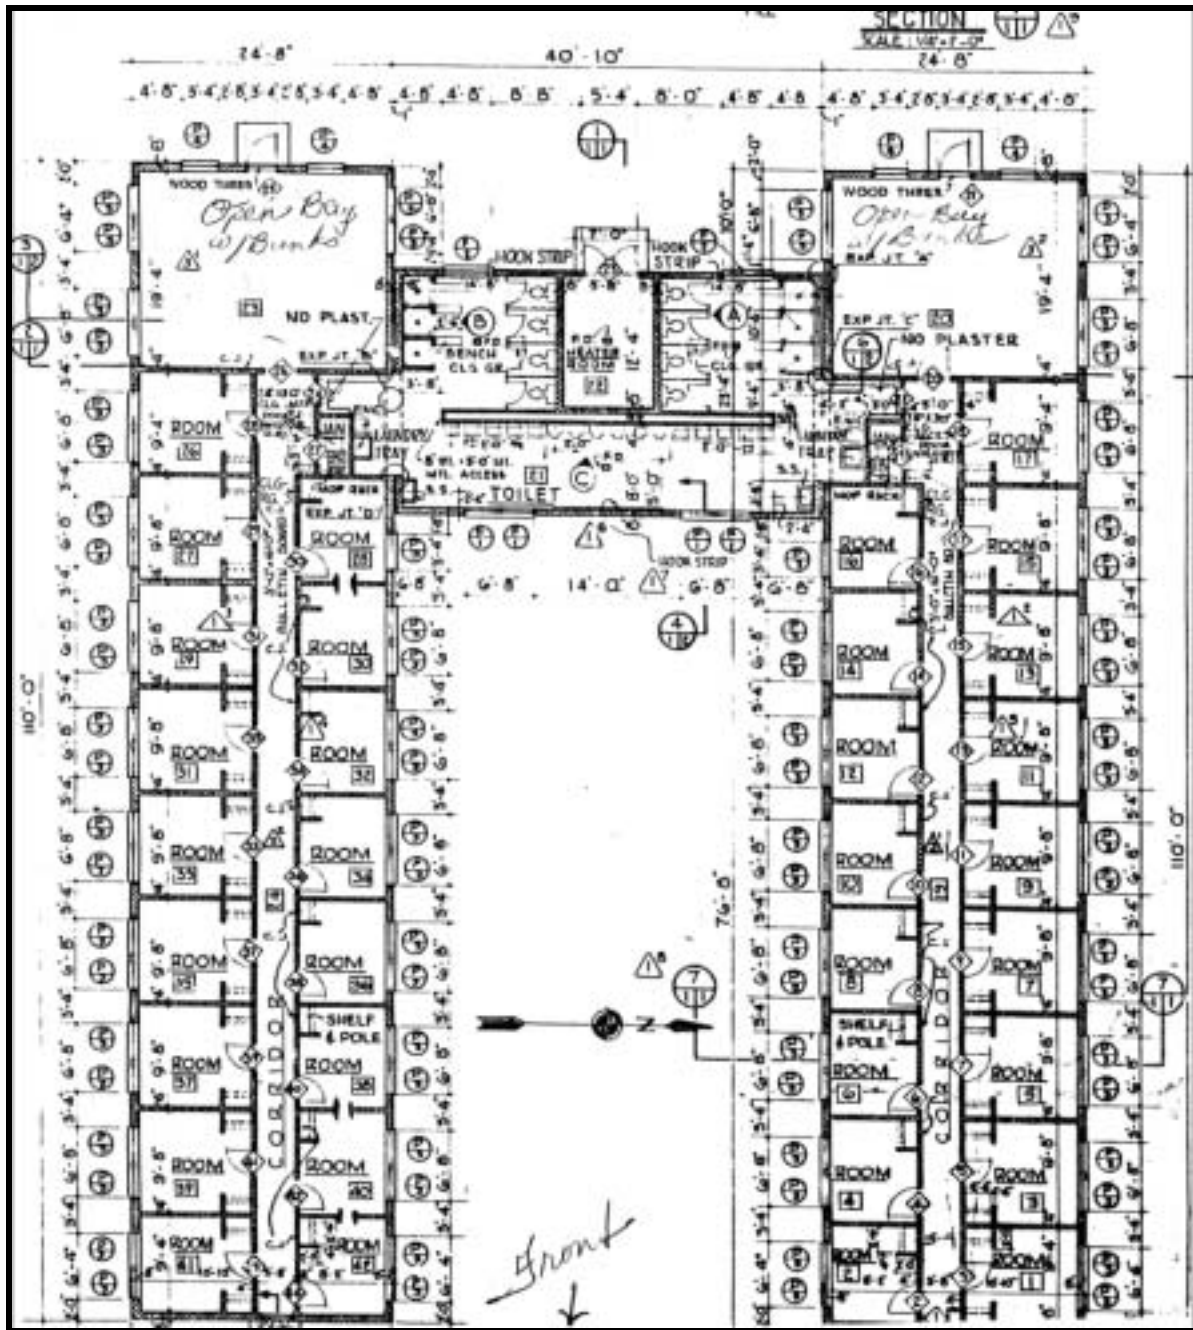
Semi-permanent “U” BOQ, floor plan, Bldg. 9517, Ft. Bliss (ca. 1957) (Real Property, Ft. Bliss).
